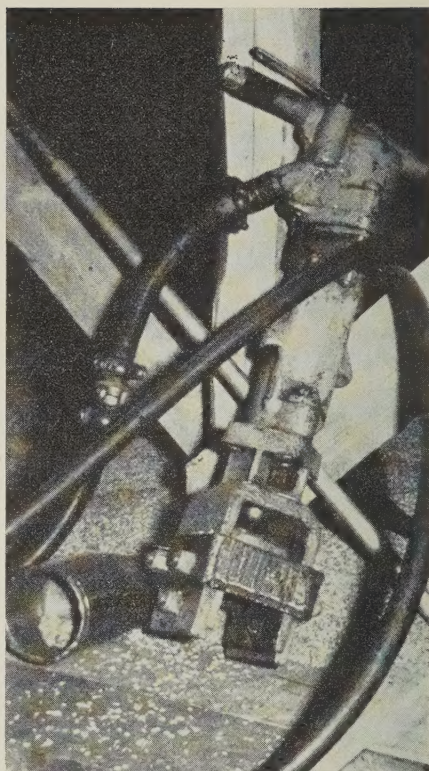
Sheet pile hammer with flat bar mounted at the lower end. Dolly lying to the left.
